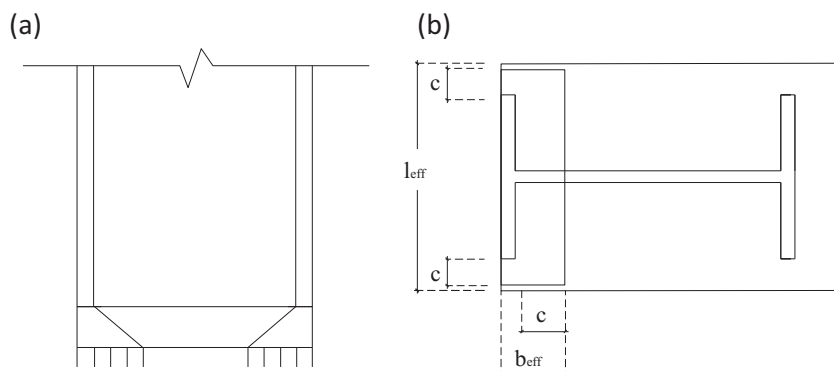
Area of equivalent T-stub in compression for large projection: (a) elevation view, (b) plan view.
